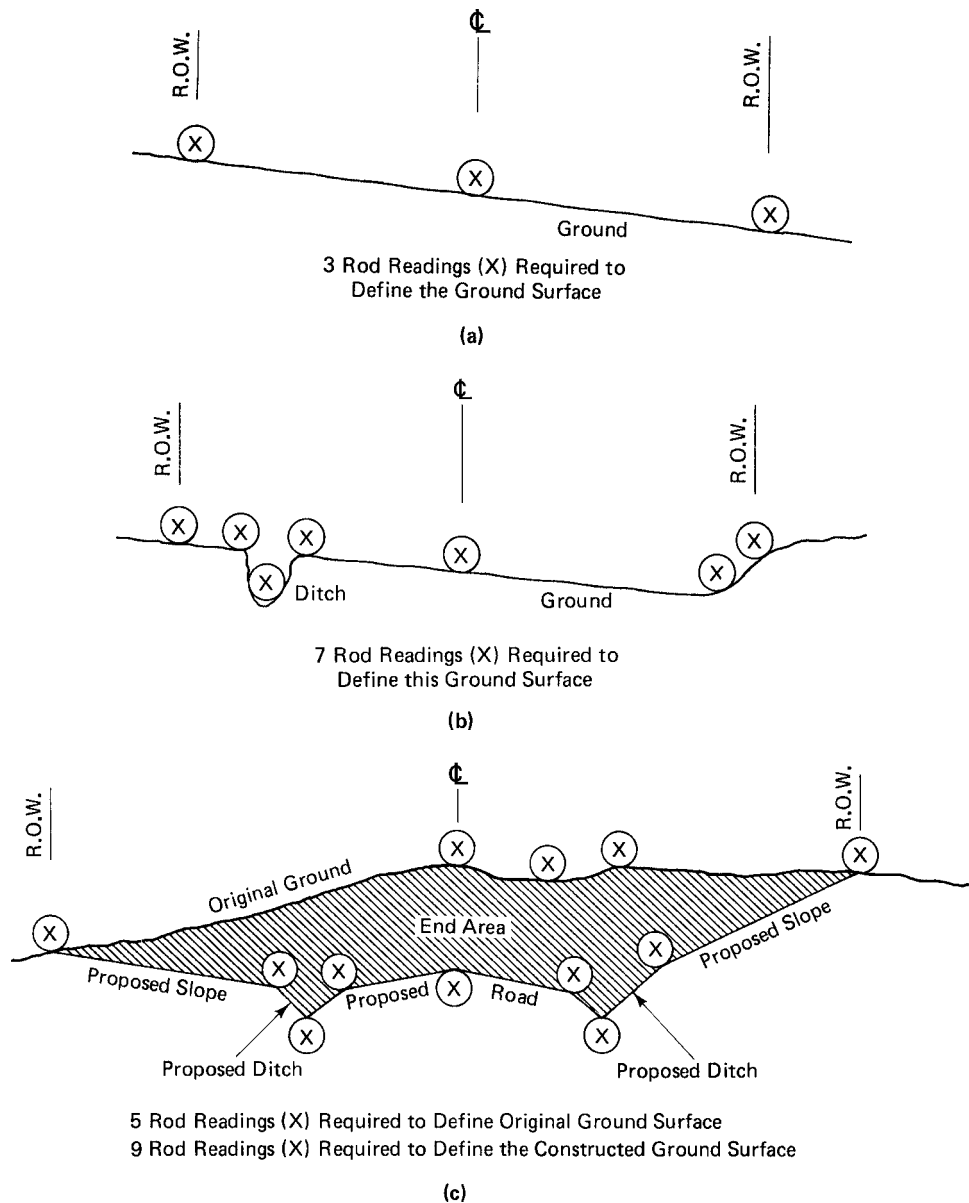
Cross sections used to define ground surface. (a) Uniform slope; (b) varied slope; (c) ground surface before and after construction.
